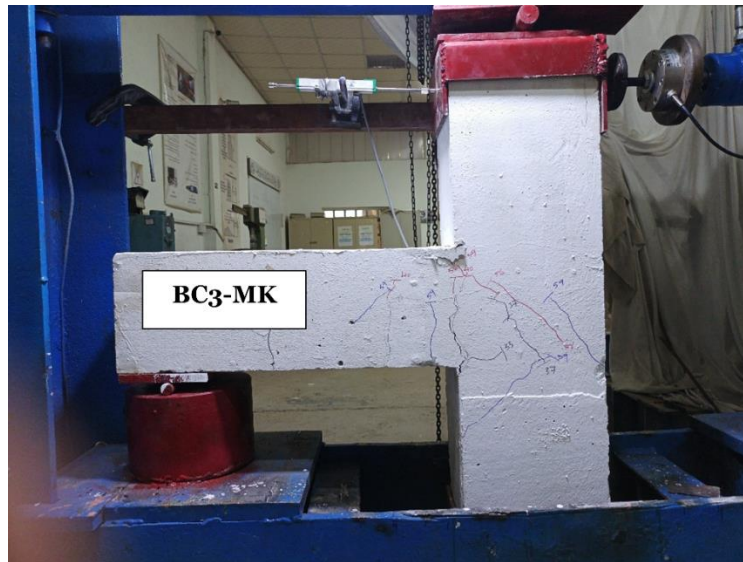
A picture of the loading technique specimen and prototype structure employed in the test setup
